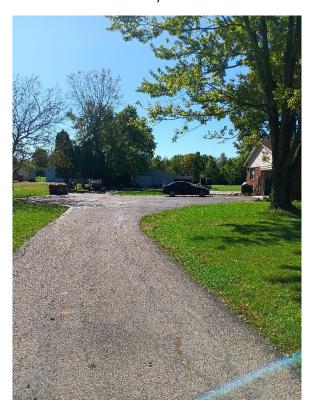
Closer picture of driveway leading to location where proposed accessory structure will sit.
